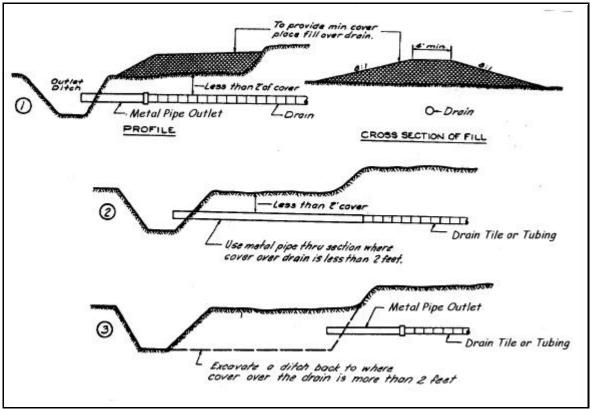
Methods for handling shallow depths at drain outlet (Source: NRCS Engineering Field Handbook)
